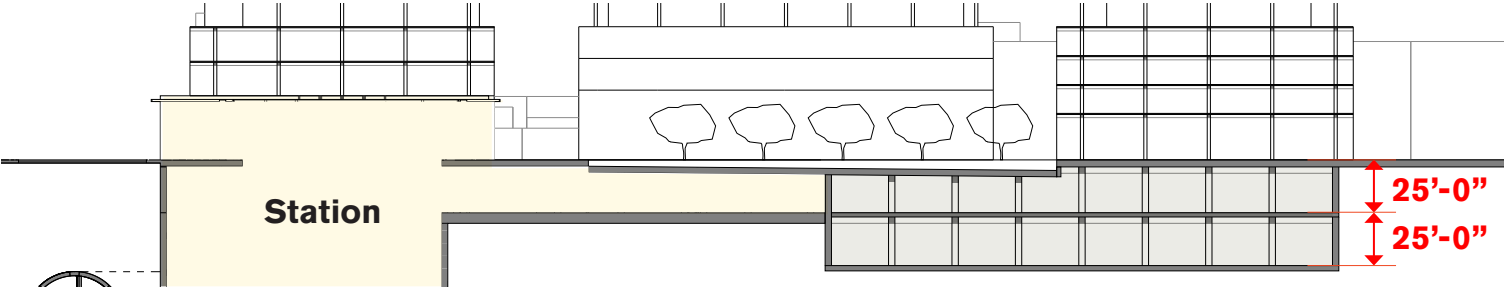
Current Floor to Floor 25' : Triple Car Stackers
